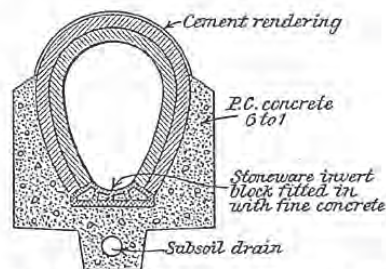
Section of Egg-shaped Sewer, showing use of Invert Block and Subsoil Drain.
